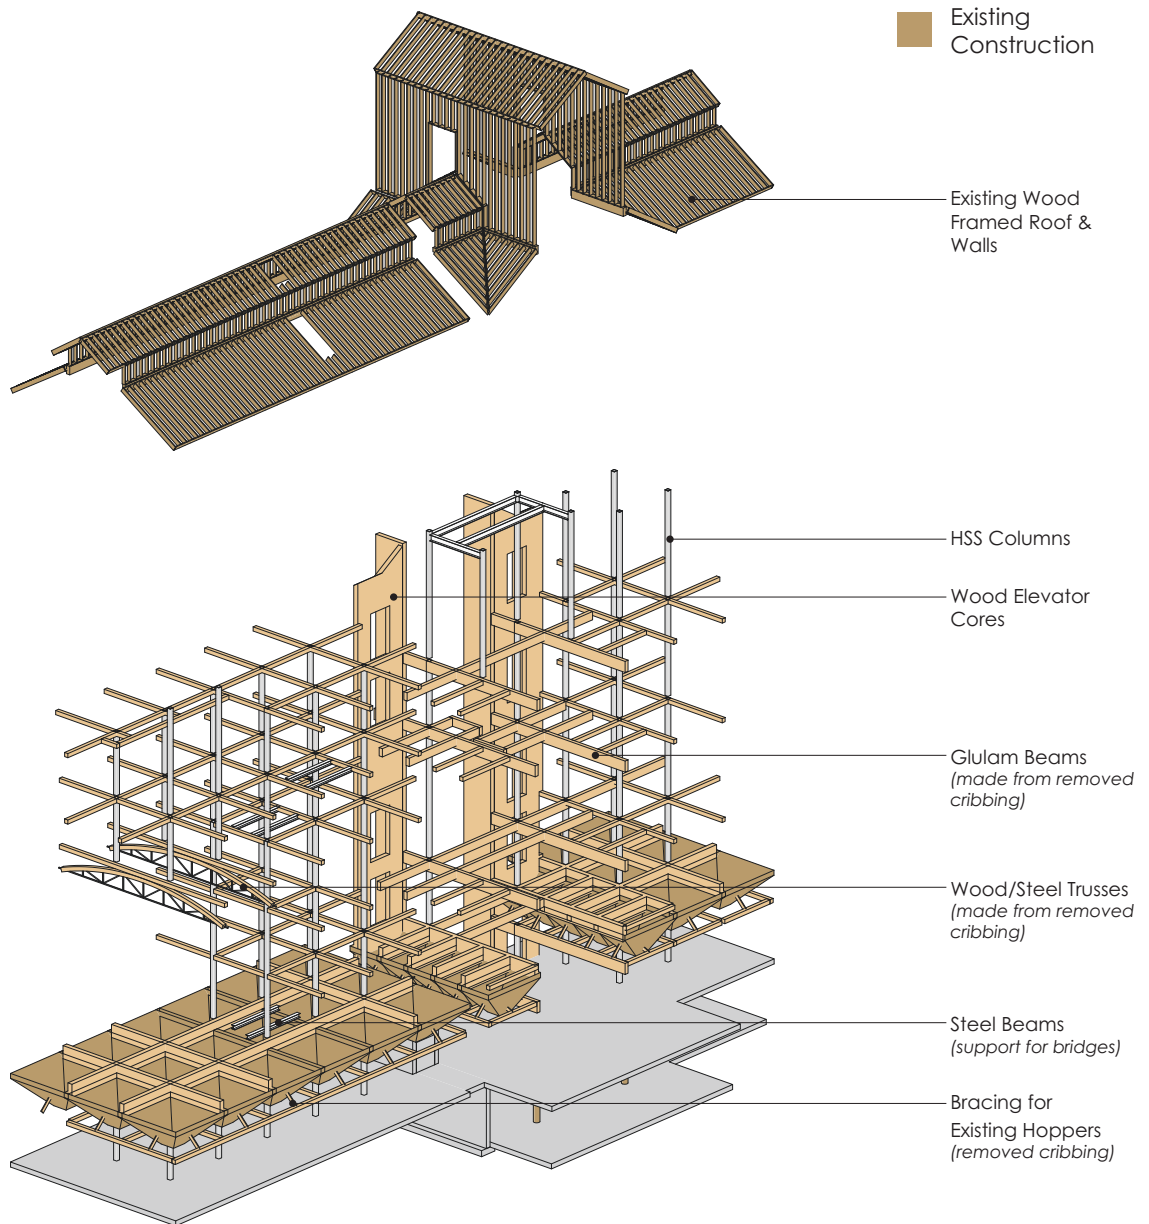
Structure added in place of the removed cribbing on the interior of the elevator.
